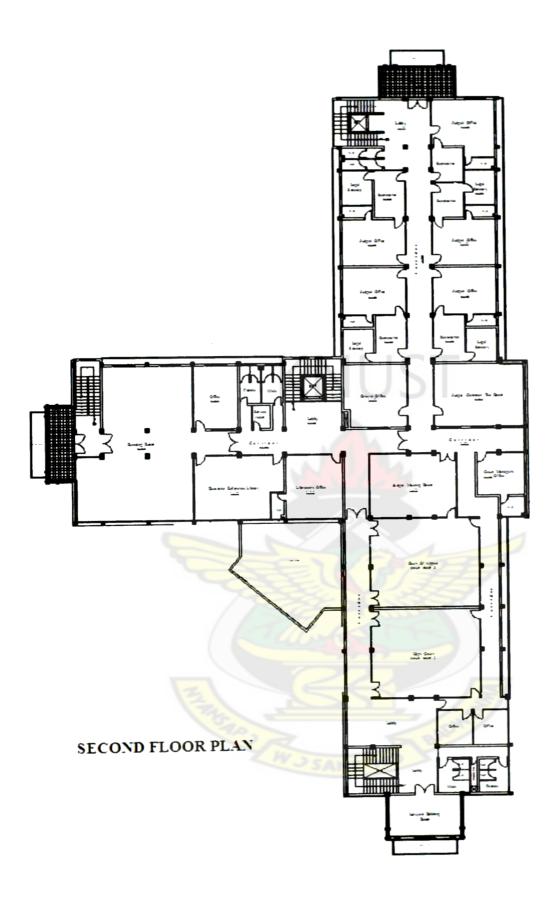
Second Floor Plan. Kumasi Court of Appeal, Ghana.
